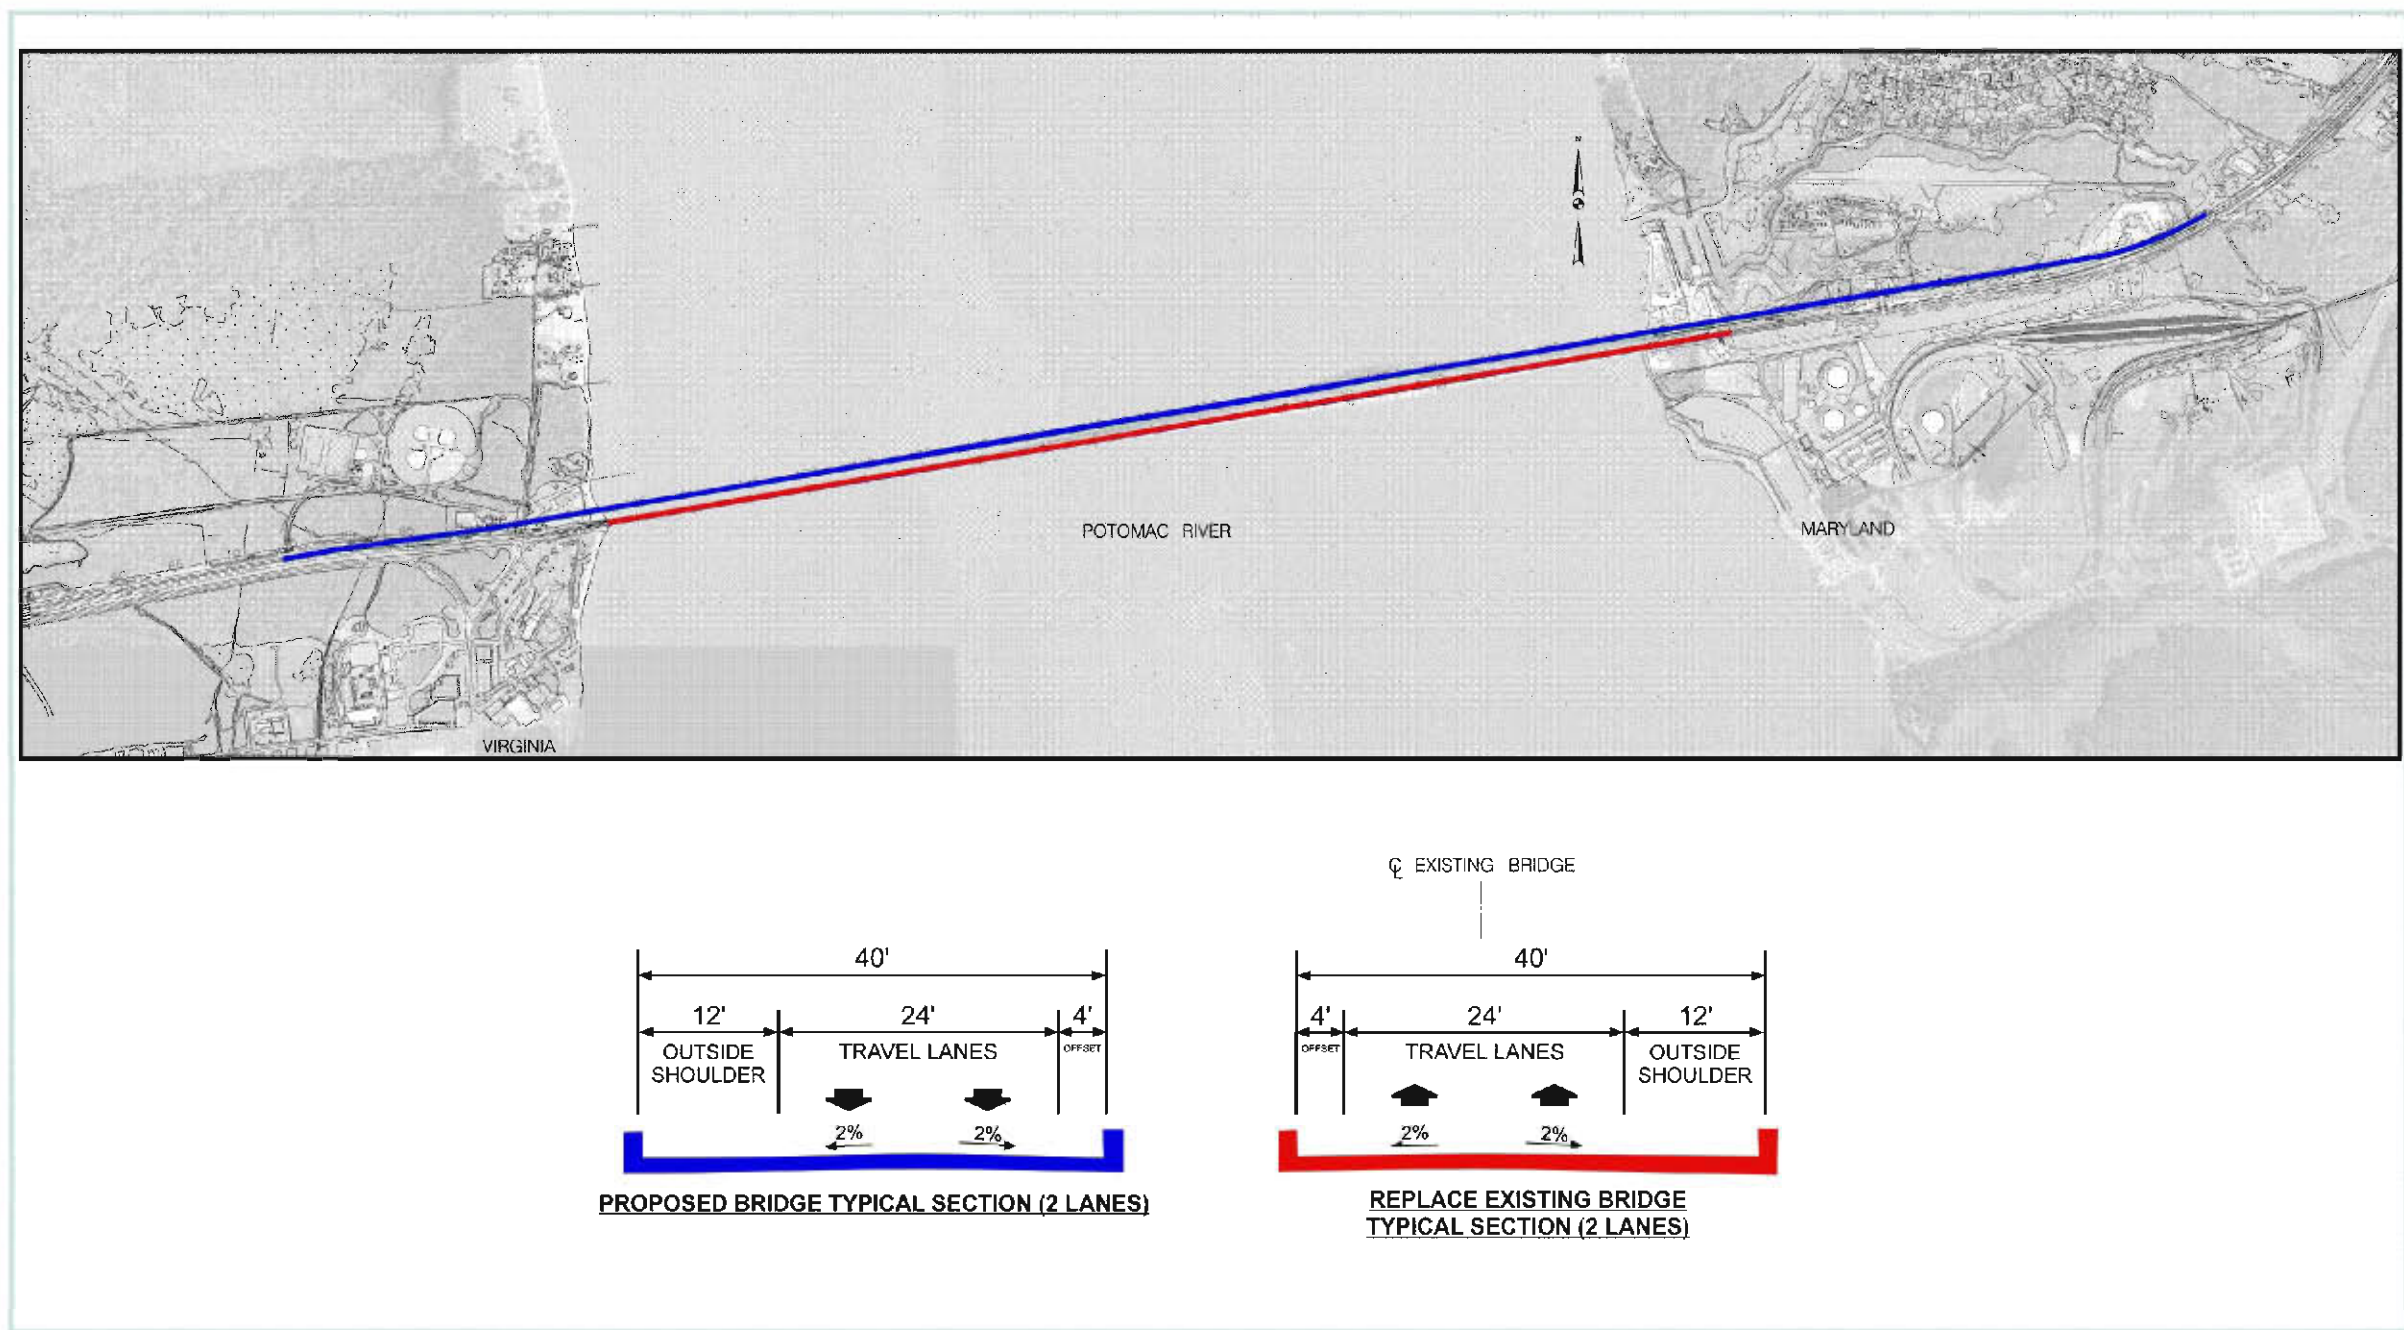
Alternate 5 - New Two-Lane Bridge to the North, Replace Existing Bridge.
